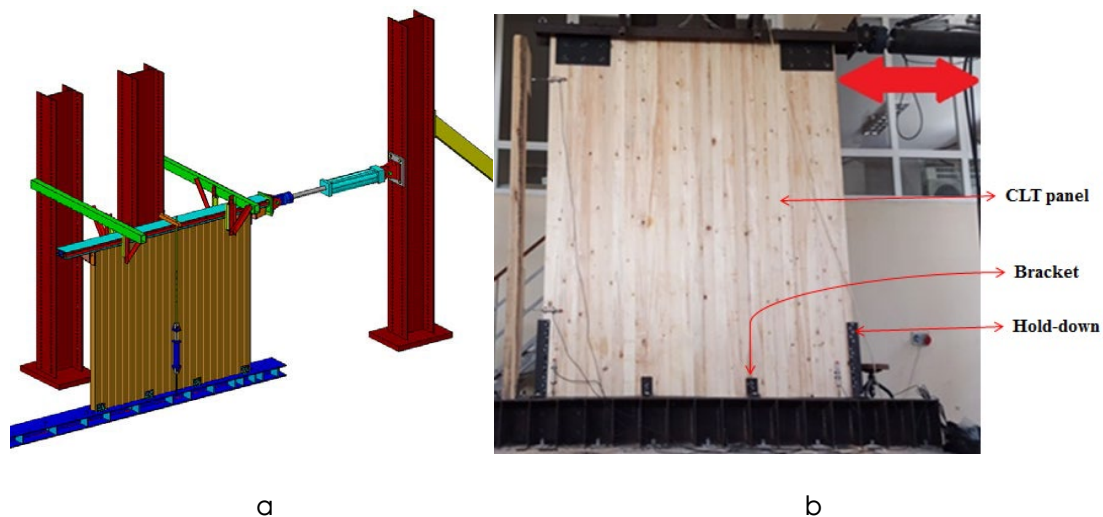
a) Sketch of the test setup used for CLT walls b) CLT wall during test
